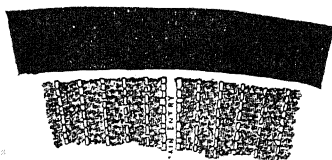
Plan illustrating pillar work and gob packing with a strong roof.
